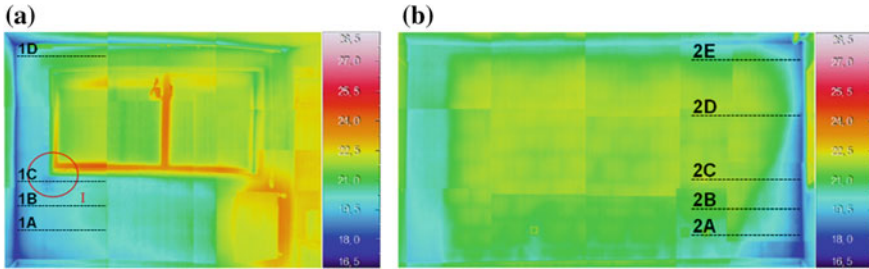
Thermal images of the walls in a room: a wall 1; b wall 2
